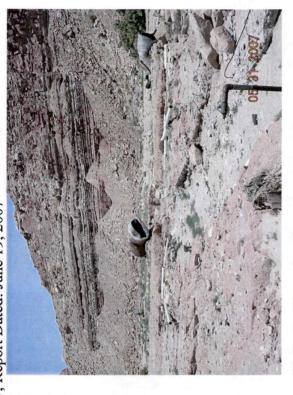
The culverts were washed from an upstream crossing. Note the PVC pipe.
